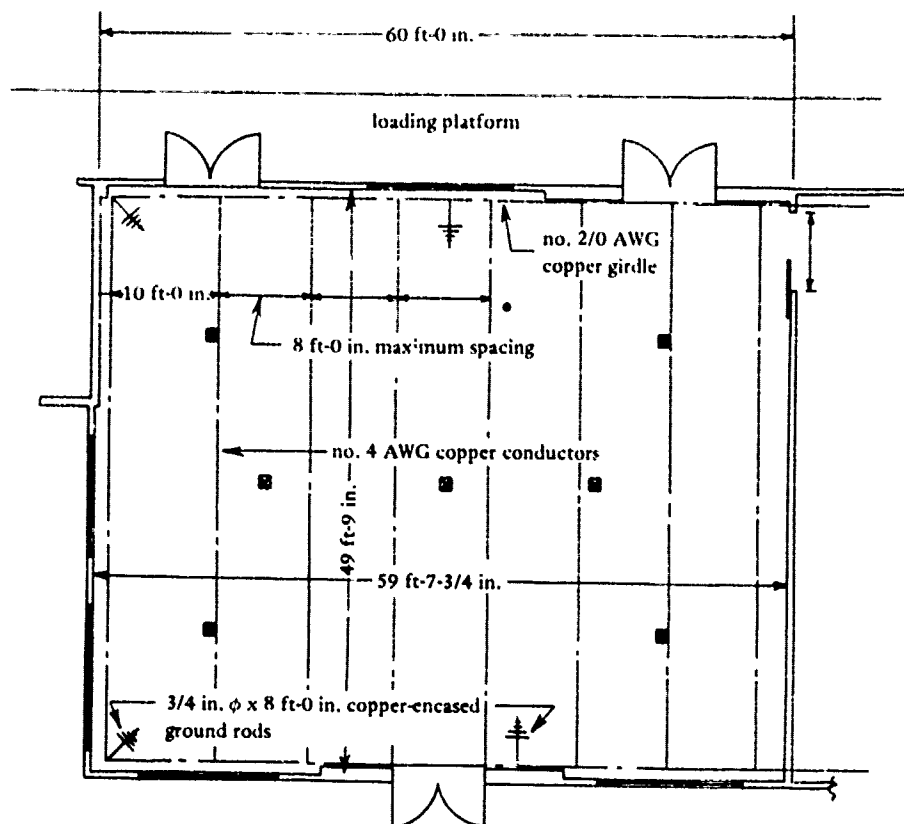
Reproduction of floor plan for conductive metallic topping floor and grounding installation at NAD, Hawthorne, which was based on NAVFAC TS-9F15a.
